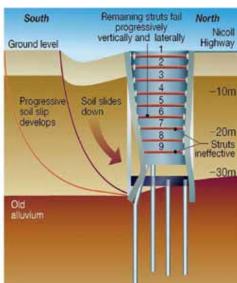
Cross Section and likely mode of failure, Nicoll Highway
